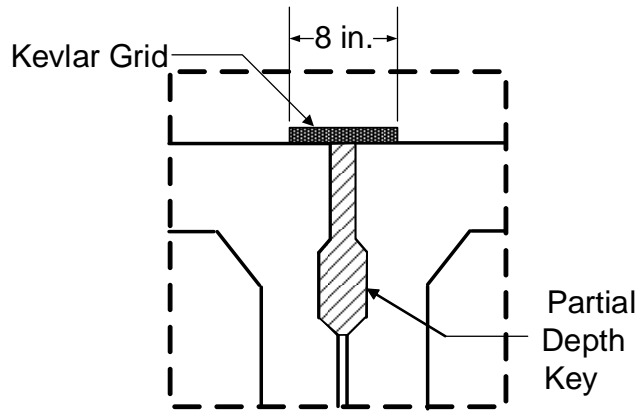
Cross-sectional details of BI-48 beam sections as implemented by VDOT.
